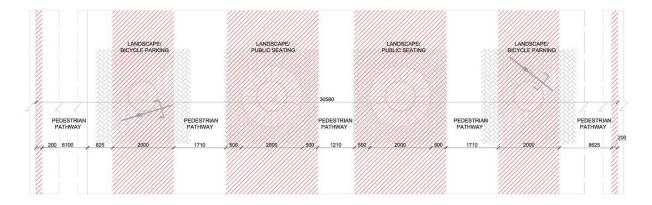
Street width and buffer spaces (in mm) for Gateway 7 in the area surrounding Hauptwache in Frankfurt am Main
